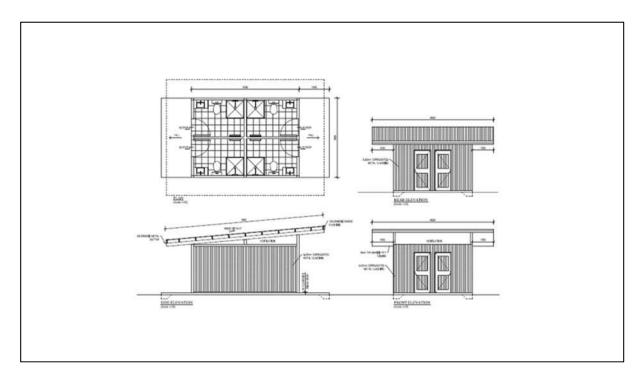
Concept Drawing 2 – Proposed Ablution Block layout
